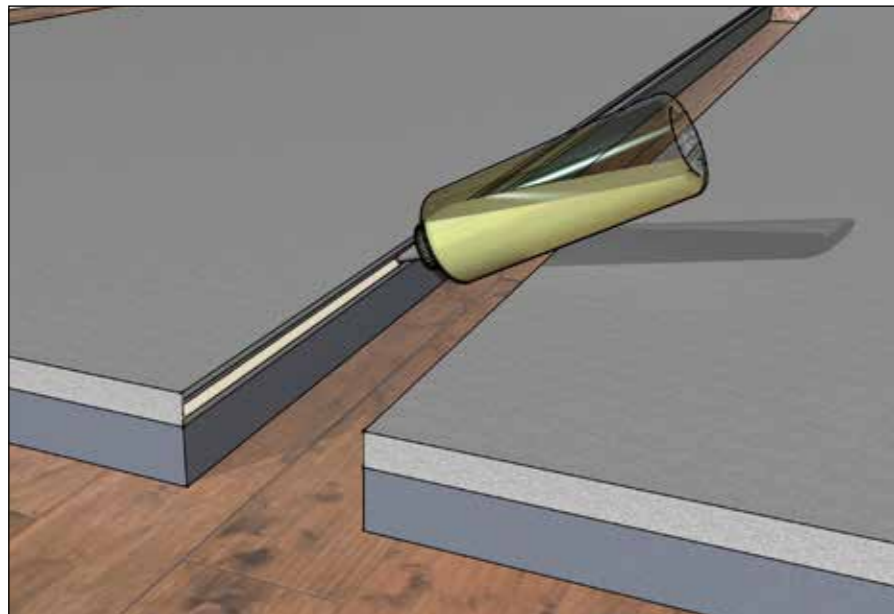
Gluing tongue and groove joints in Spacetherm Multi
